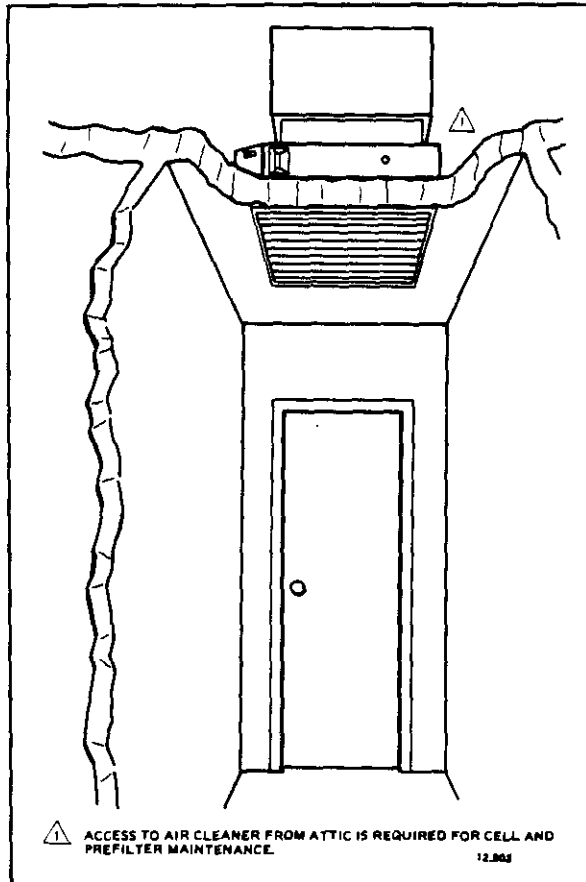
HORIZONTAL FURNACE. AIR CLEANER IS MOUNTED HORIZONTALLY ABOVE CEILING.
